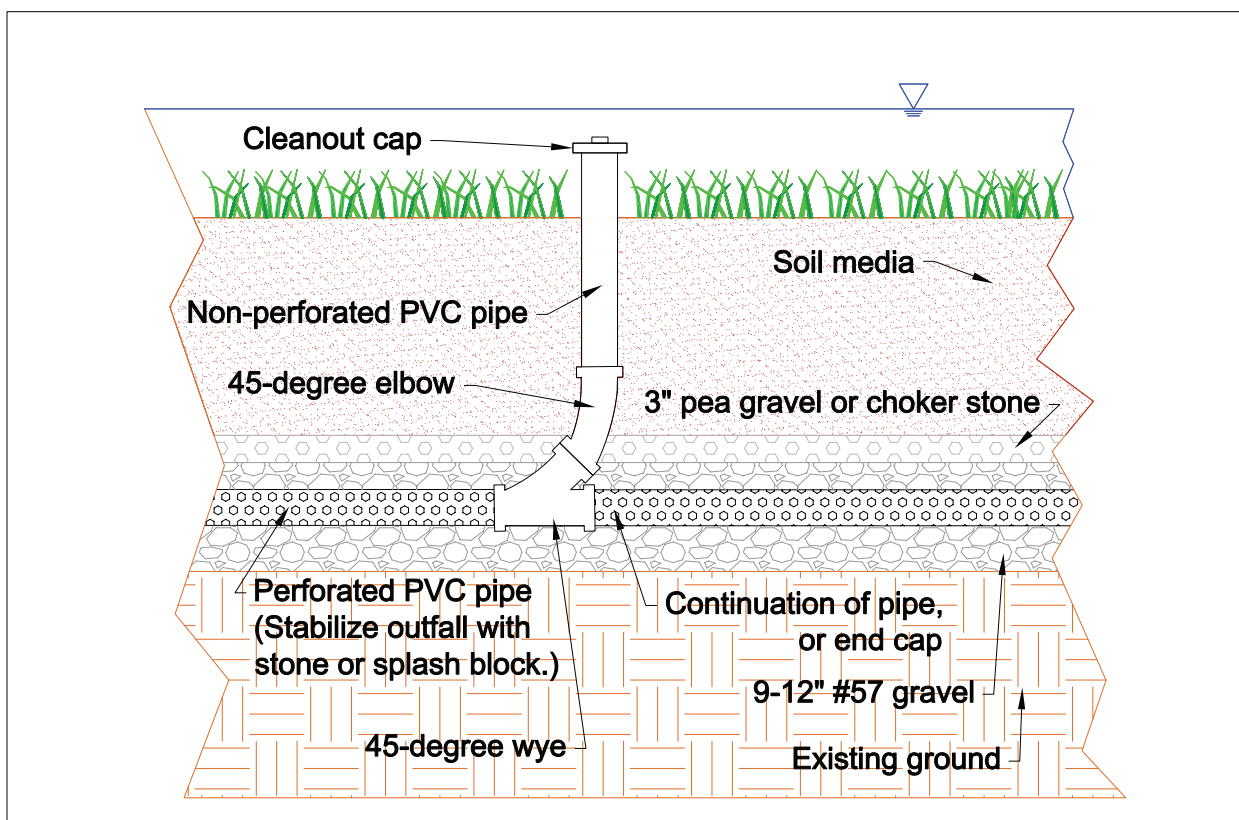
Cross-section of Bioretention With Underdrain
